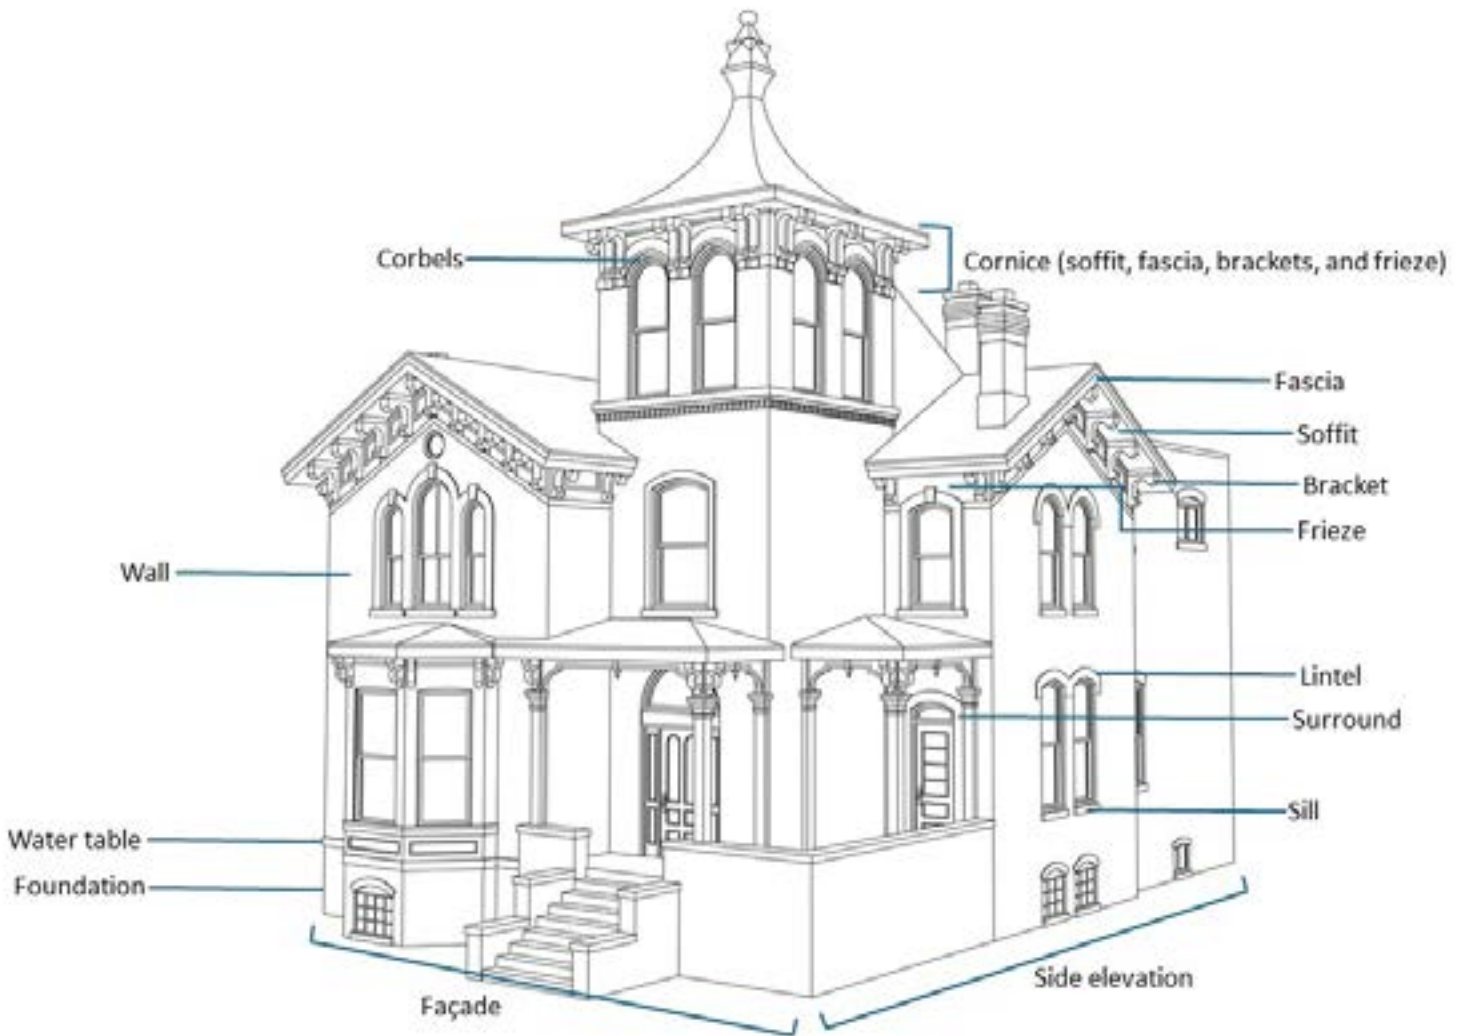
An Italianate-style house, showing walls, foundations, architectural features, and trim.
